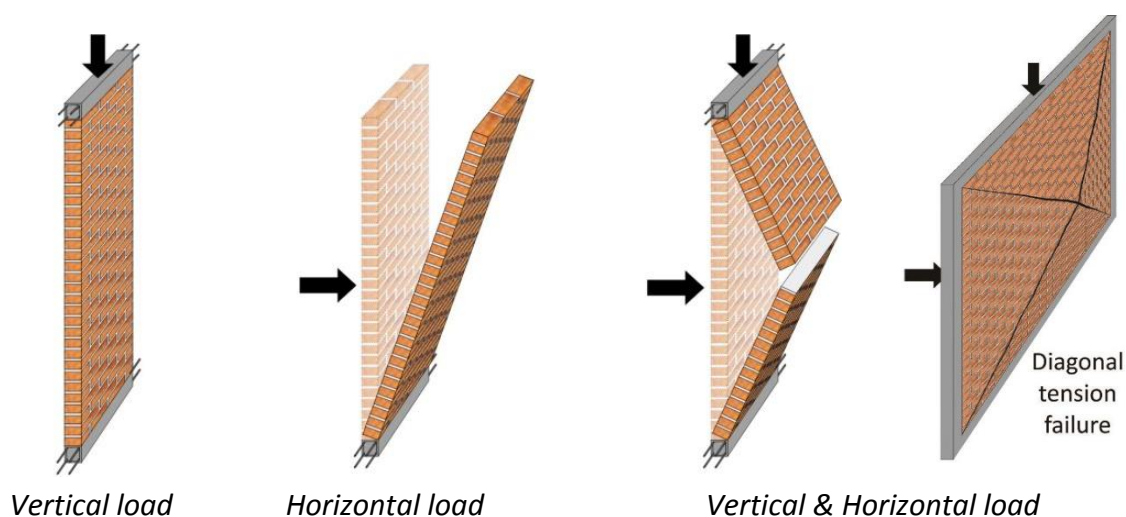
Behavior of URM Wall Subjected to Vertical and Out-of-Plane Lateral Load
